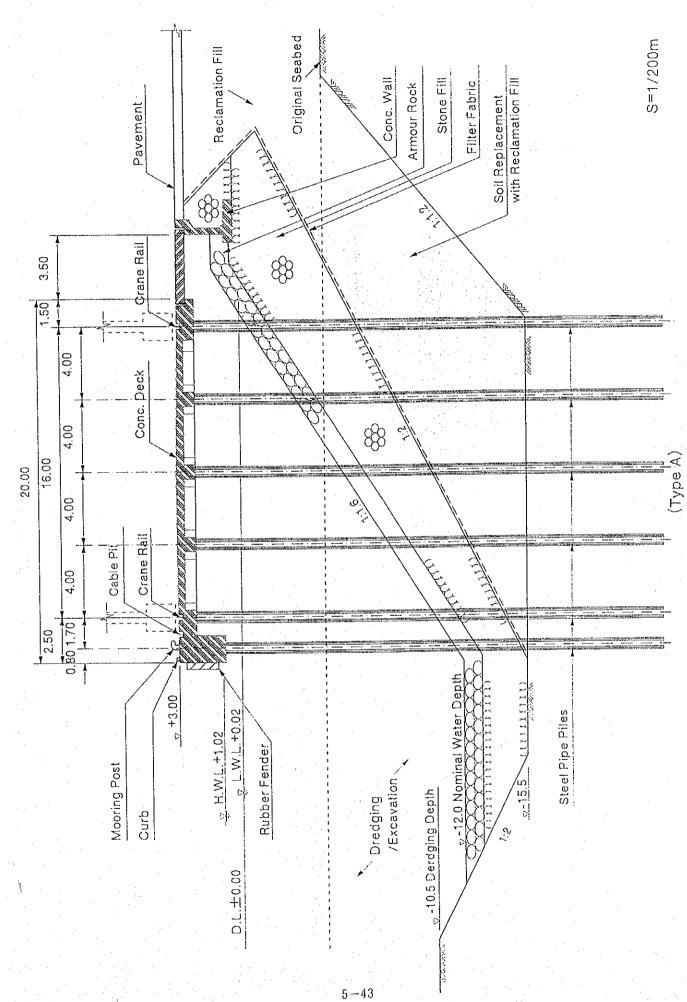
Typical cross section of berthing facilities (-10.5m Container berth)
